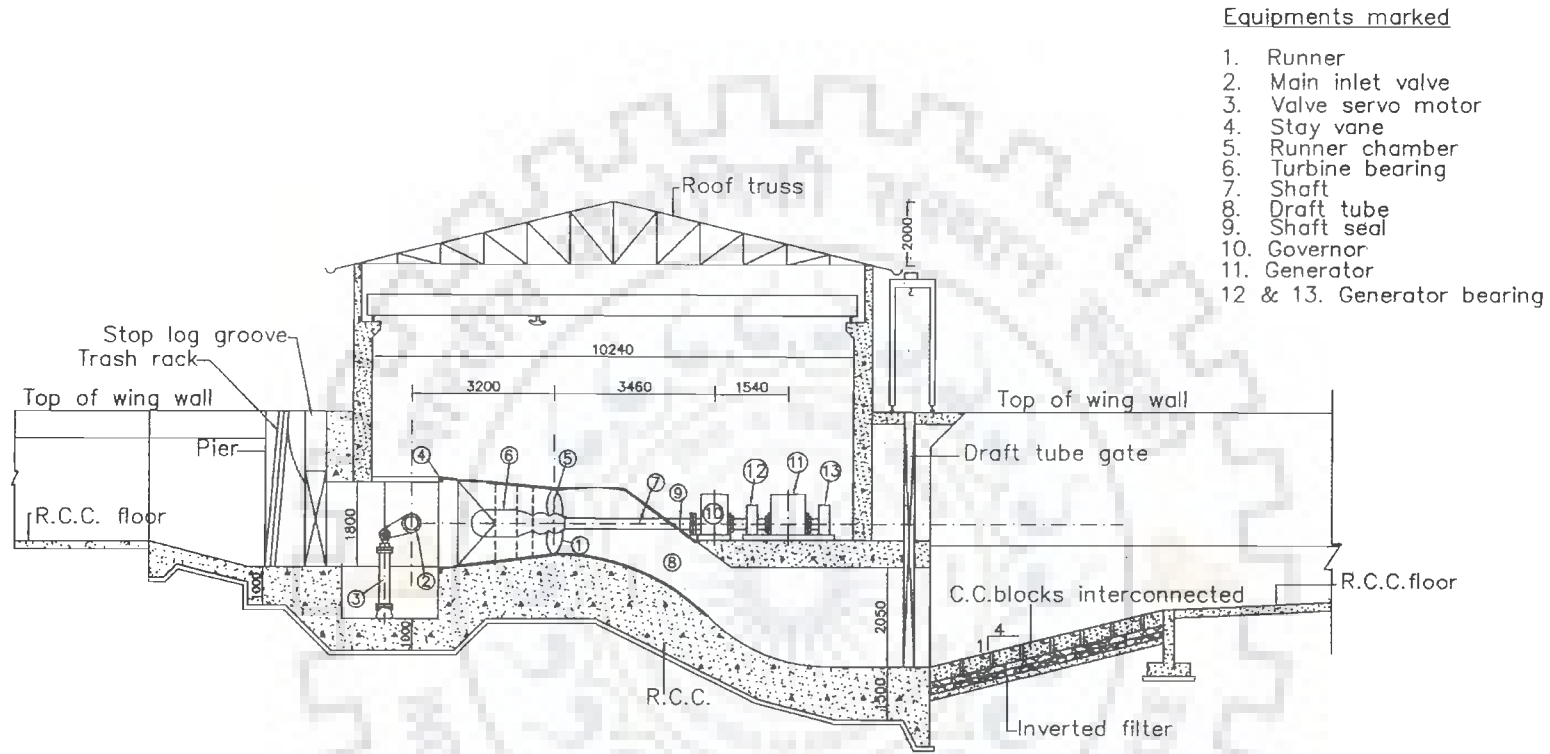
Plan of power house building for a canal based scheme (H = 10 m, P = 2 x 1000 kW)
